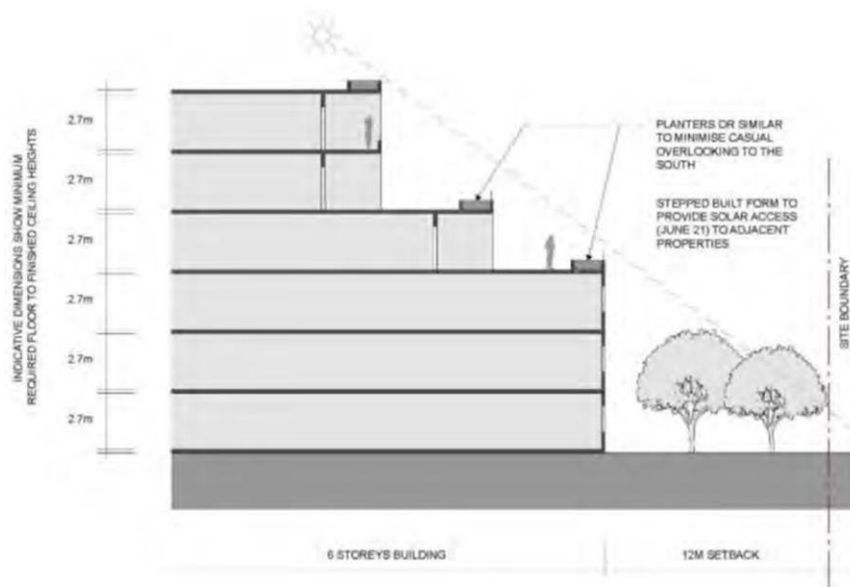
Indicative section at precinct southern boundary, adjoining Jones Street
